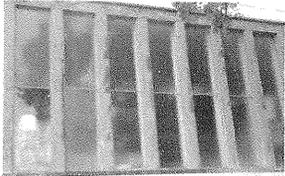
Rectangular Sanctuary window facing Huron St. Peeling paint, damaged and or rotten wood, broken window pane.
